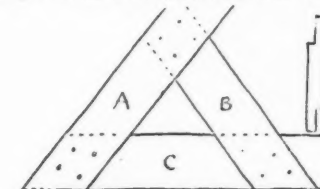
GUSSET BOARD 'B' STIFFENS JOINT BETWEEN RAFTER 'A' & CEILING JOIST 'C'.
